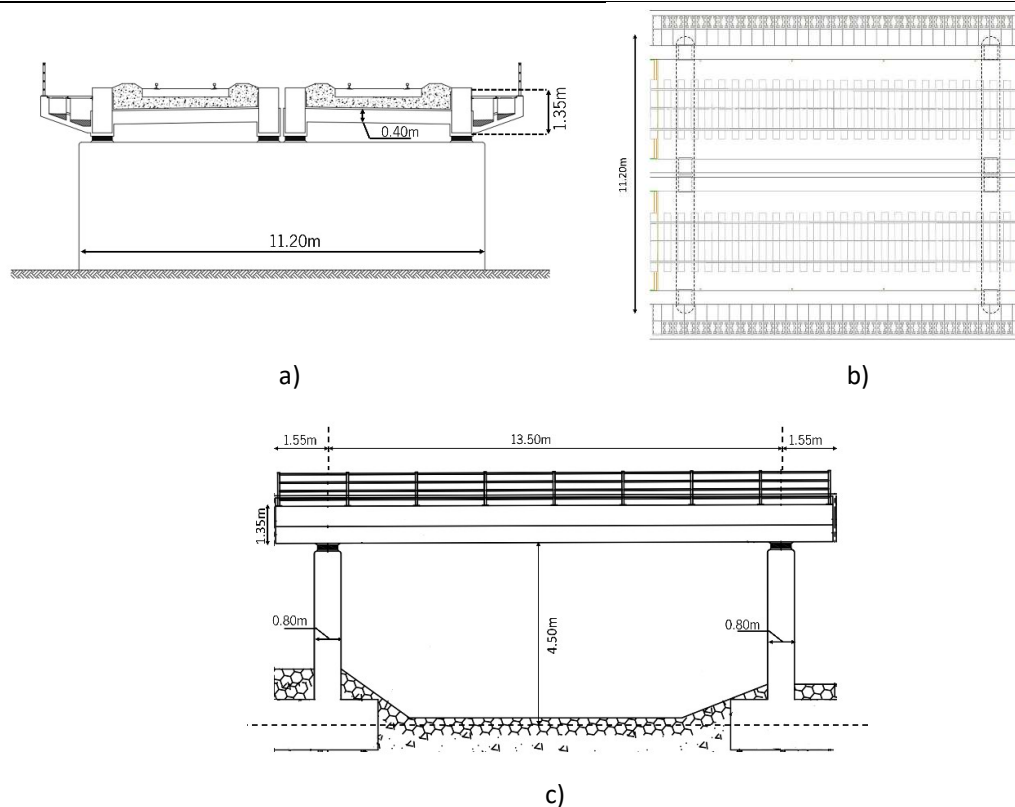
Frame view: a) Cross section; b) Top view; c) Longitudinal view
